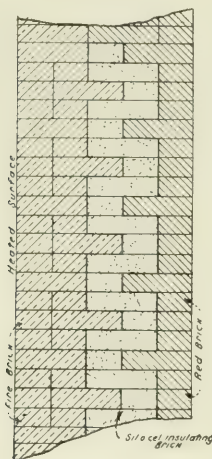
FIG. I—TYPICAL WALL CONSTRUCTION, SHOWING INSULATING BRICK LAID IN WALL
